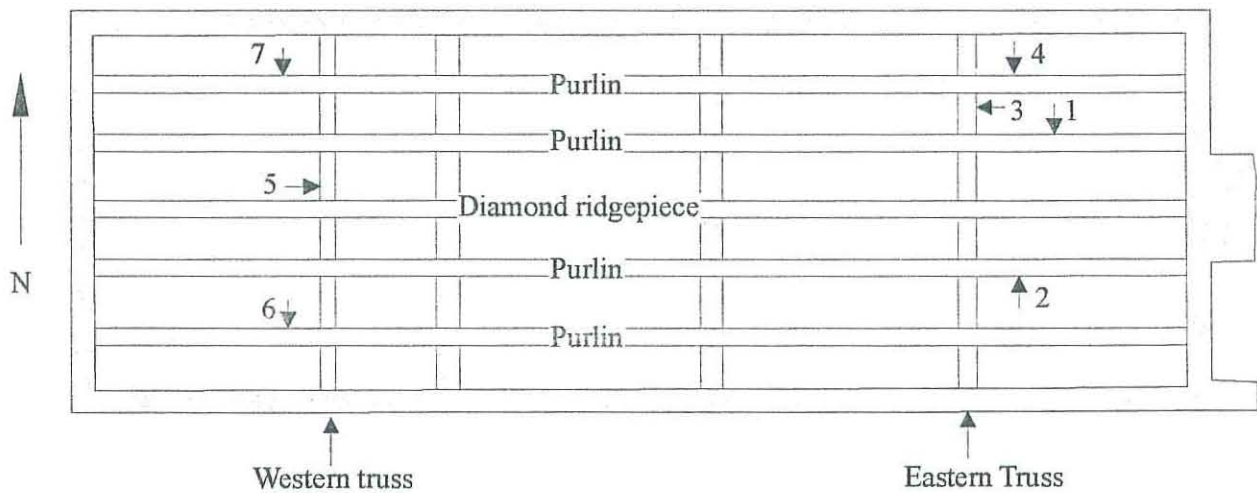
Diagrammatic roof plan of the South Wing, Baguley Hall. Location of samples 1-7
